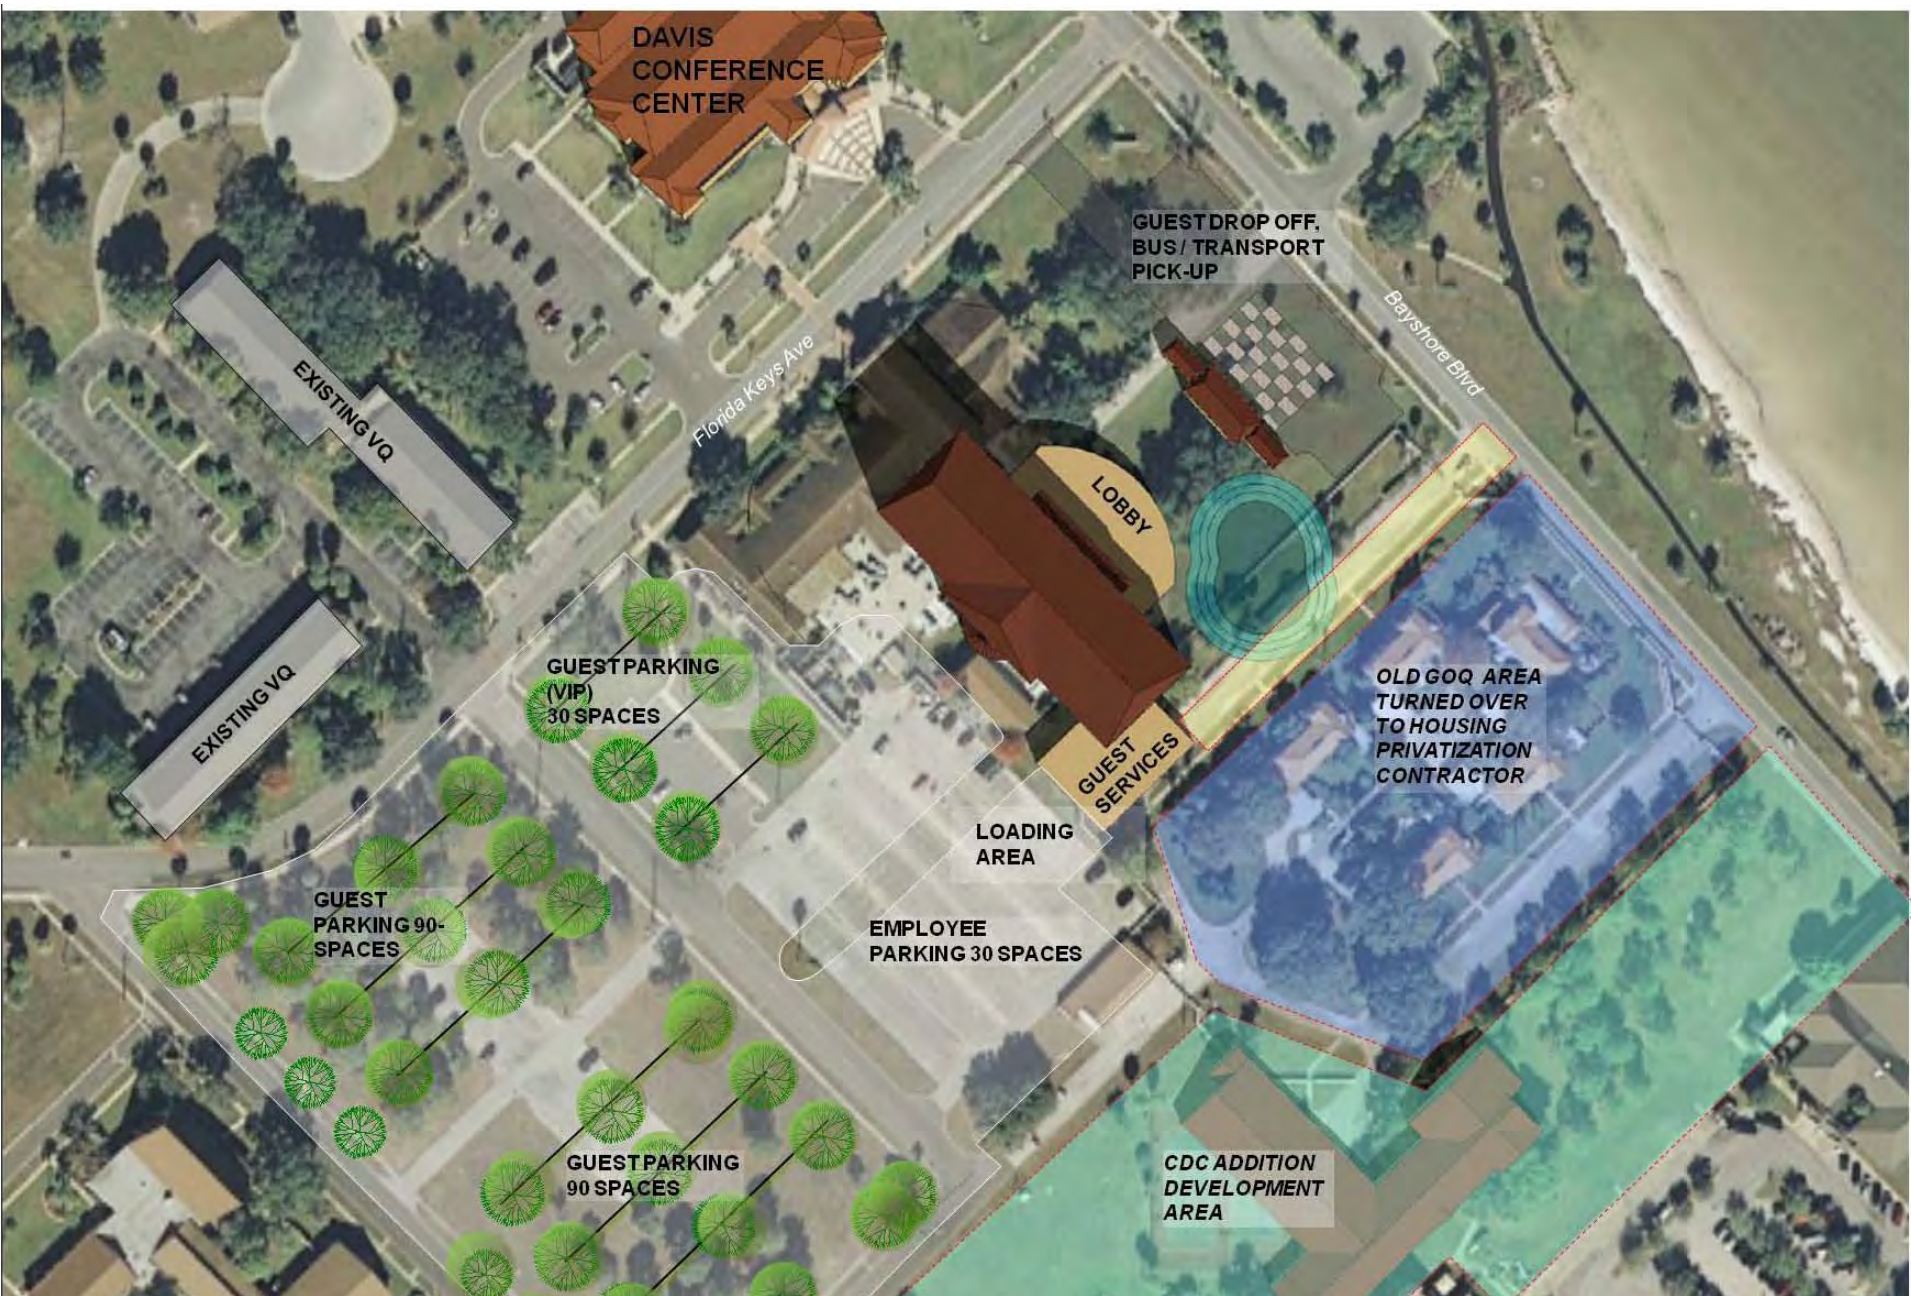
Site plan showing the new Visiting Quarters facility as it relates to surrounding facilities including the Staff Officers Quarters District, Davis Conference Center and the existing VQs.
